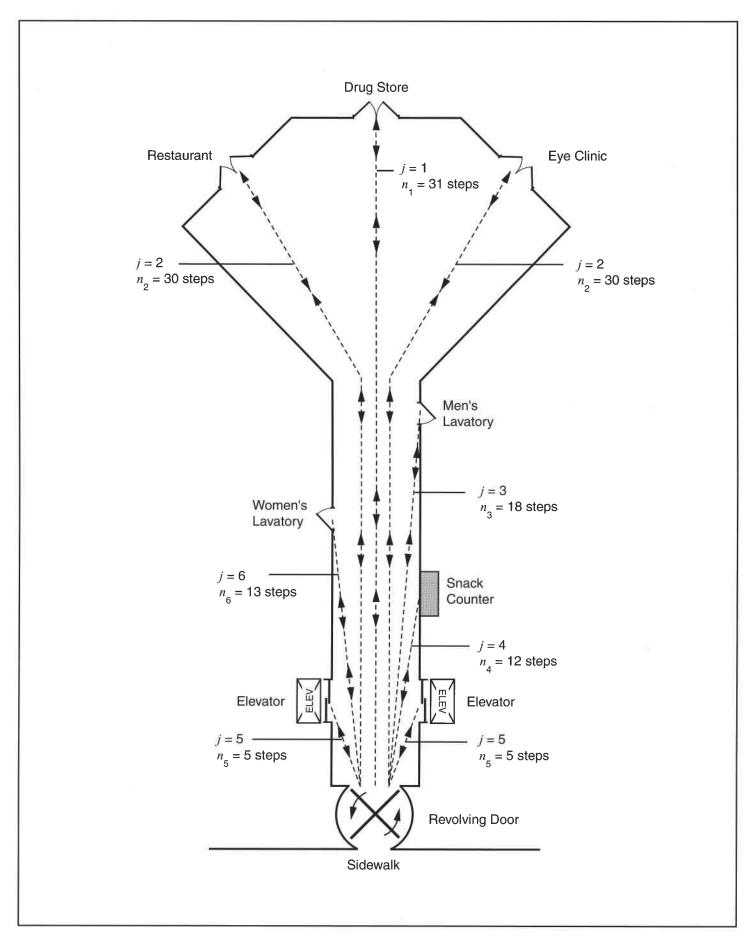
Commercial Floor Plan - Traffic Patterns, j
